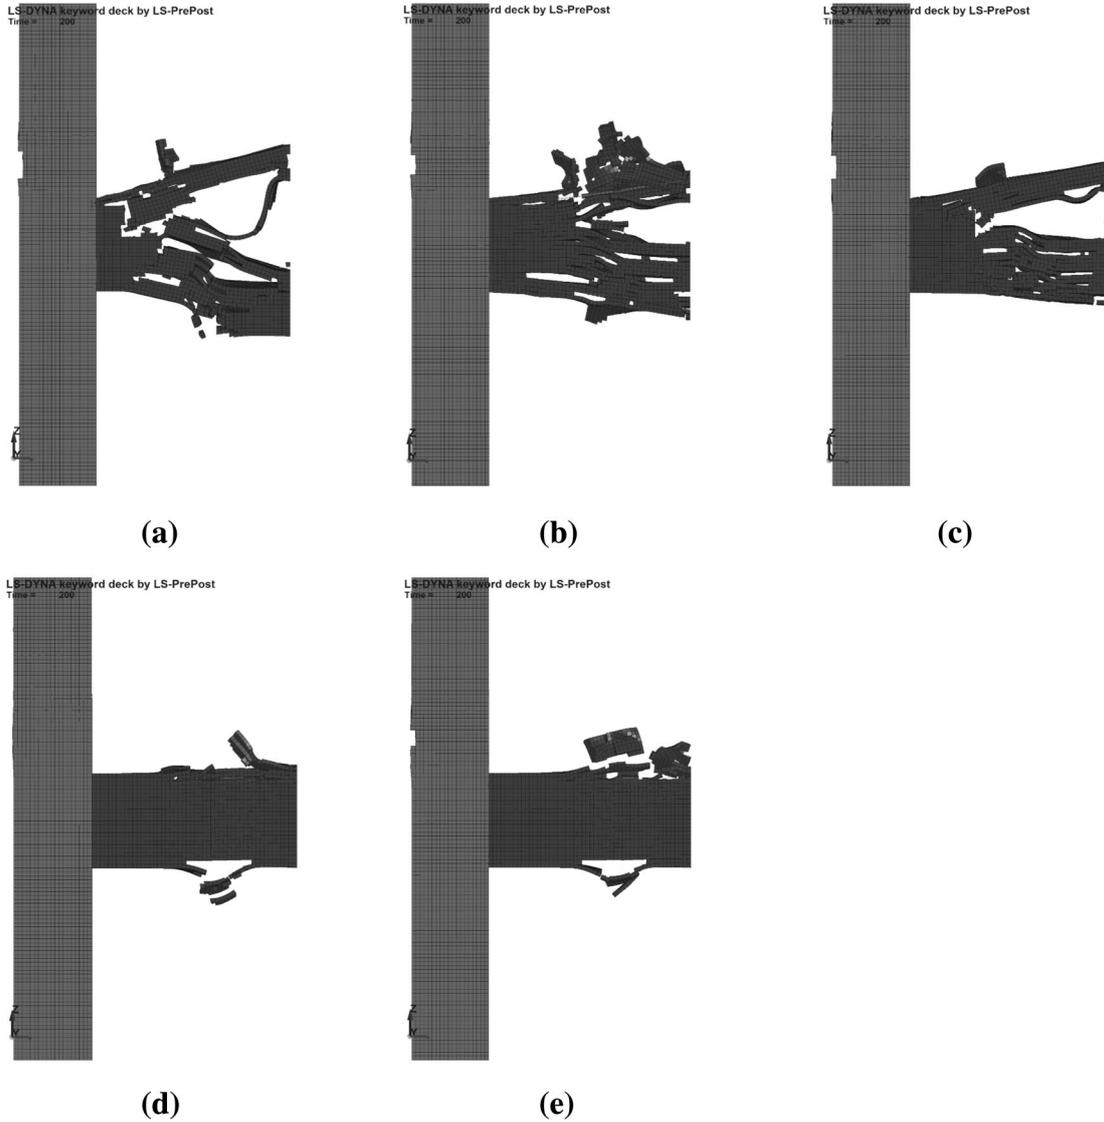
Failure shapes of specimens. a Specimen BC. b Specimen BC-F. c Specimen BC-D. d Specimen BC-F-S. e Specimen BC-A.
